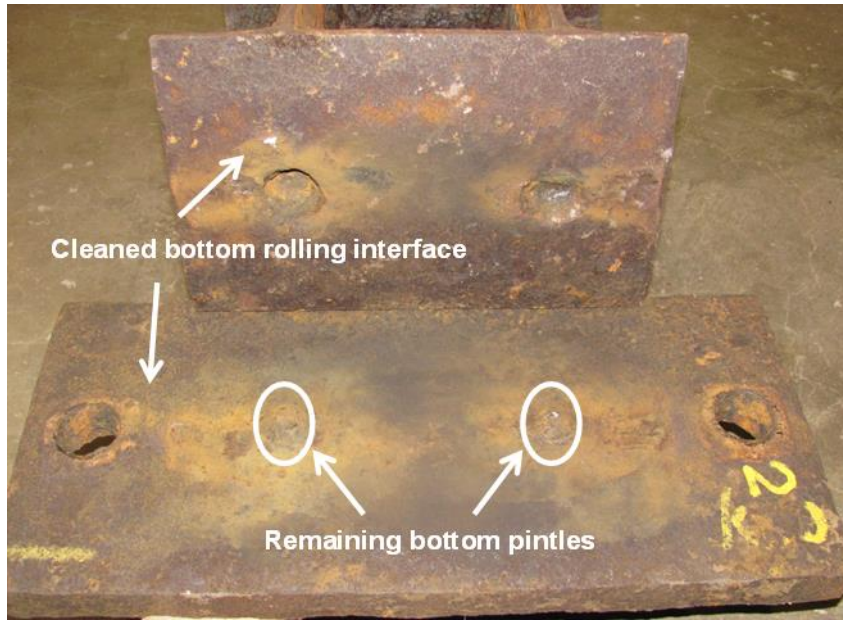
Cleaned bottom contact interface of Bearing AR23
